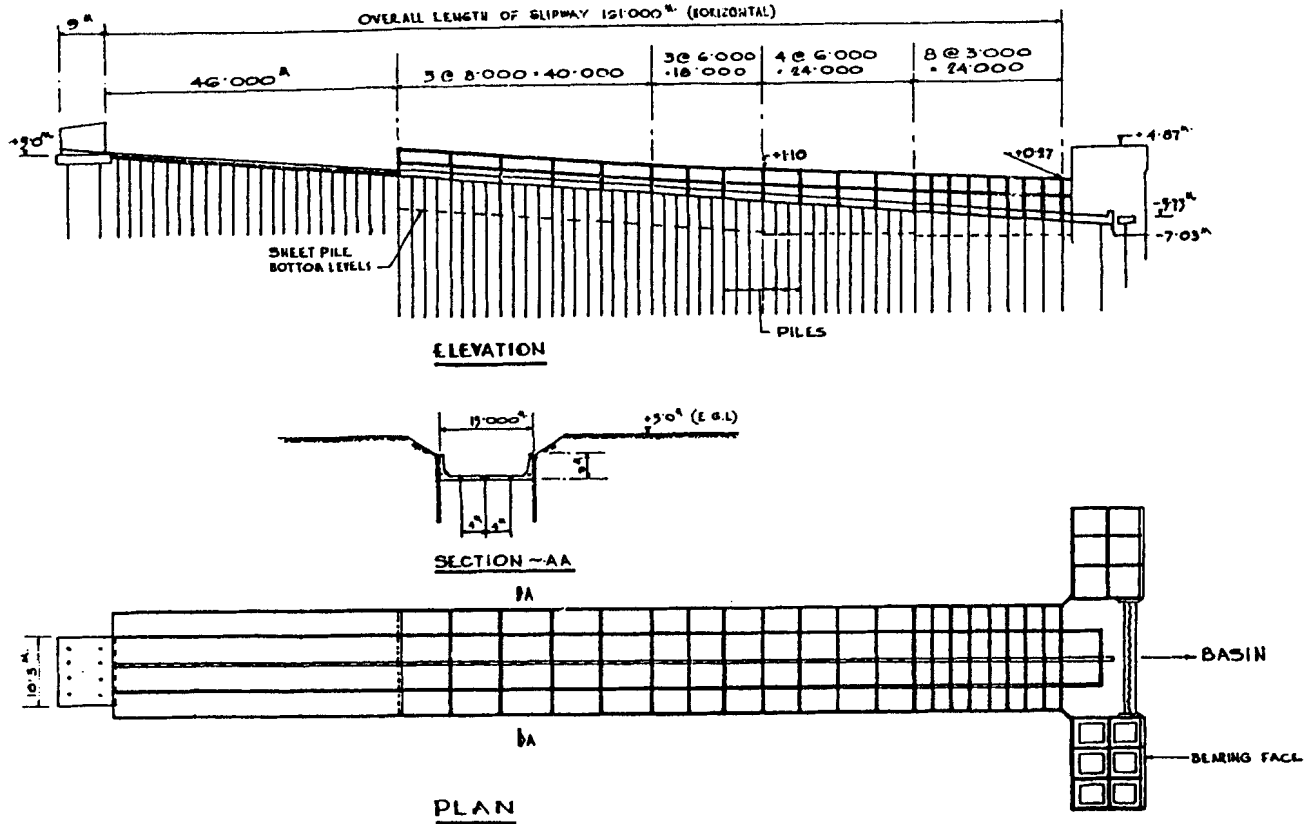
Paradeep slipway location plan. (From Banerjee and Sen, 1970.)
